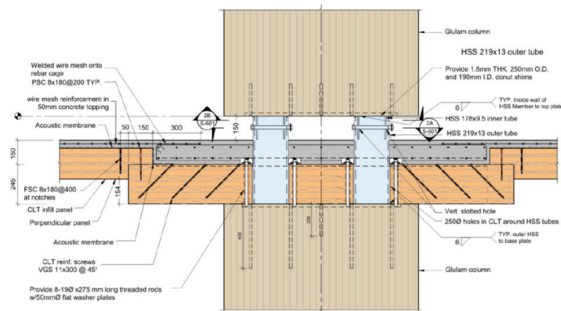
Composite CLT/concrete slab and glulam floor system and connection (Courtesy of Fast+Epp)
